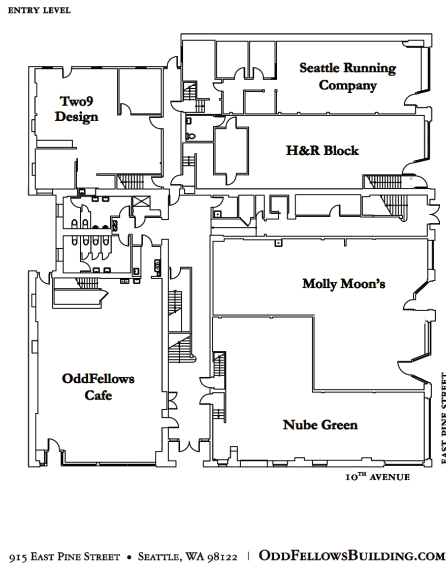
OddFellows Floor Plan- Entry Level<sup>53</sup>
